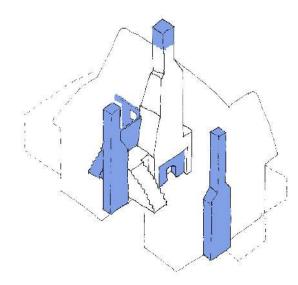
19thC phase. Brick chimneys to cross wings; fireplace infill, internal partitions and secondary staircase due to subdivision of single house into multiple dwellings
